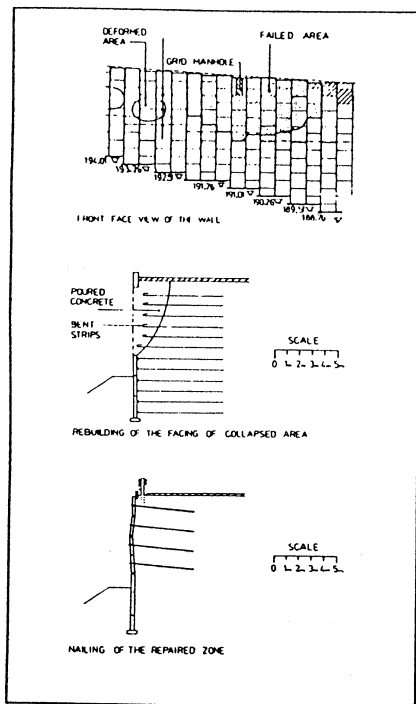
Repair of reinforced earth wall, Fréjus, France (After Long et al 1984)
